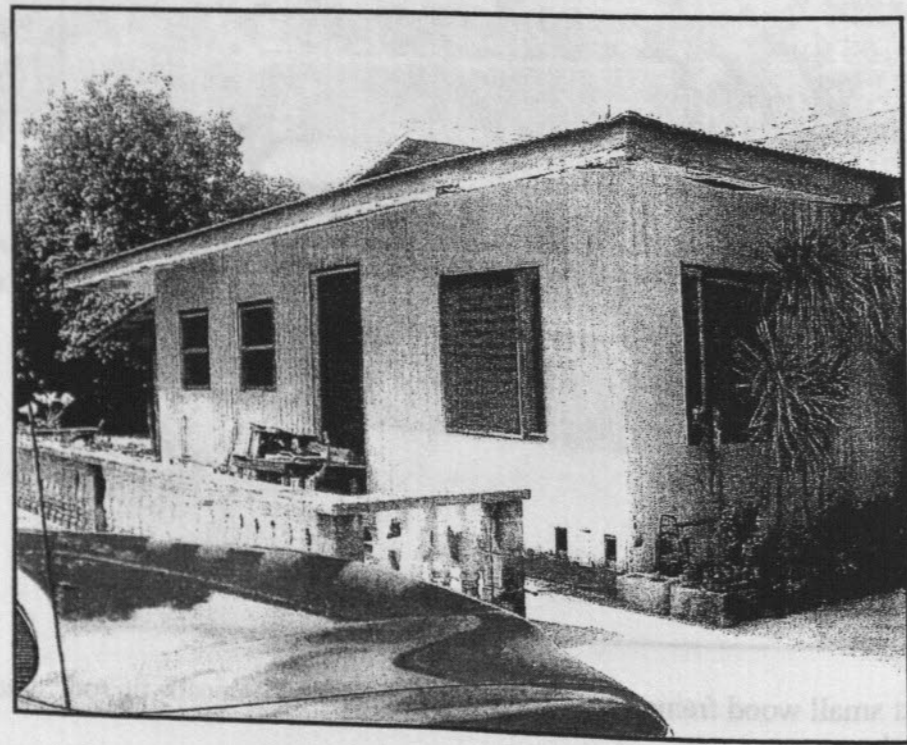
Agat: single-story house built in the 1950s with tongue and groove wood walls, tin roof, and louvered windows.
